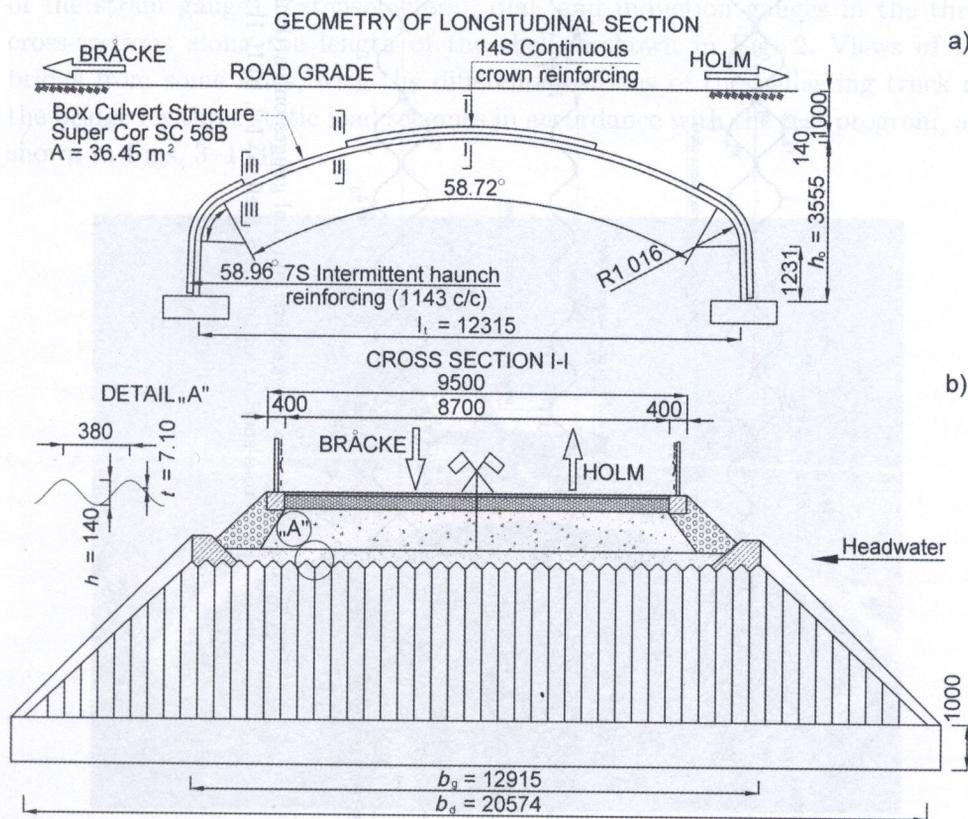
Road bridge in Gimån, Sweden, made form Super Cor SC-56B corrugated plates:
